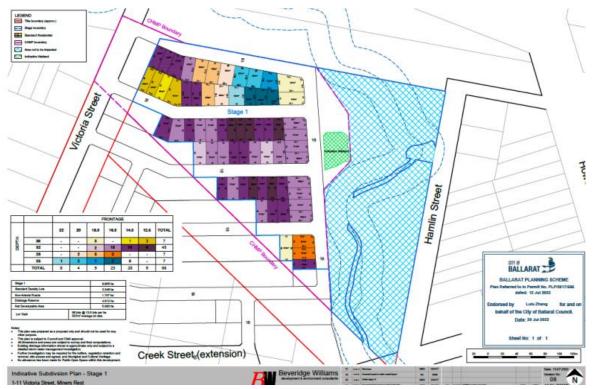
Endorsed Subdivision Plan for 1-11 Victoria Street
